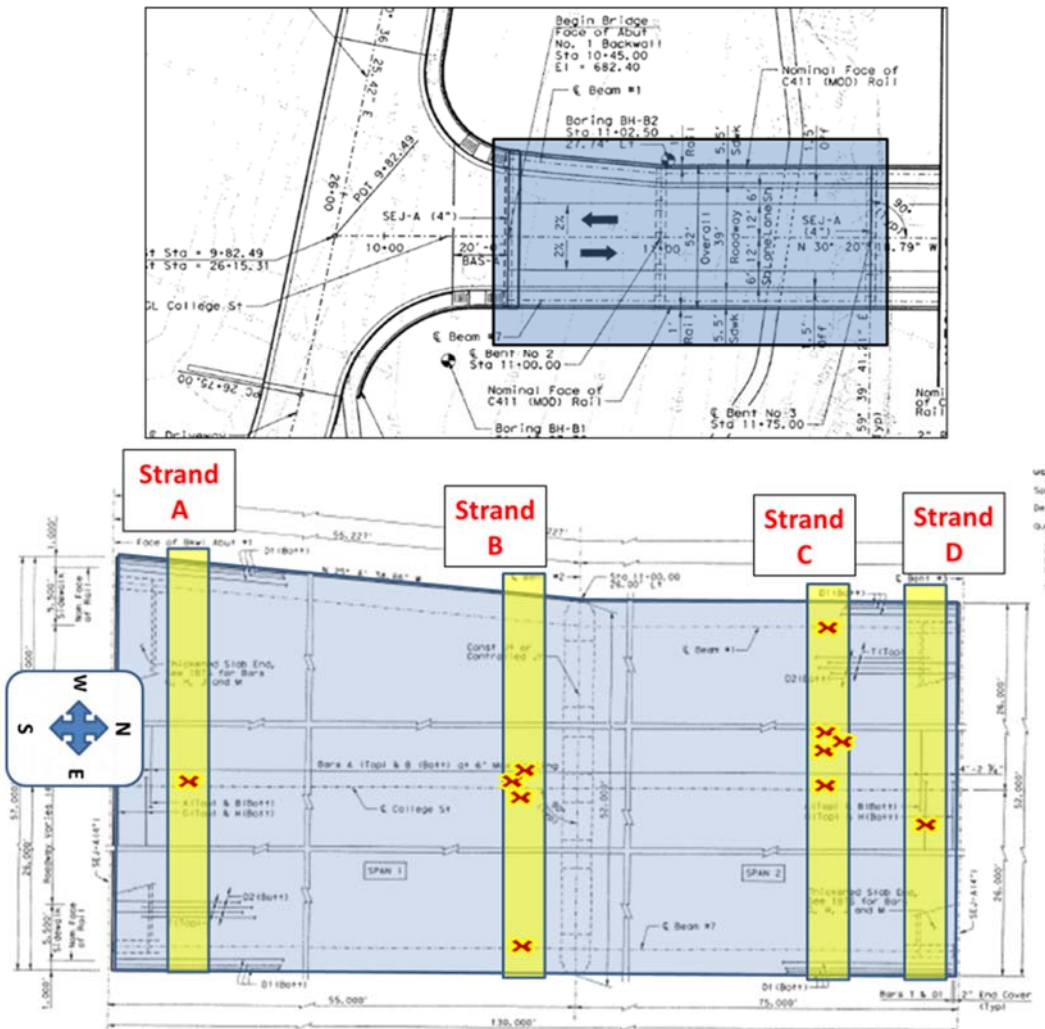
iButton string layout for Georgetown bridge deck summer pour.
